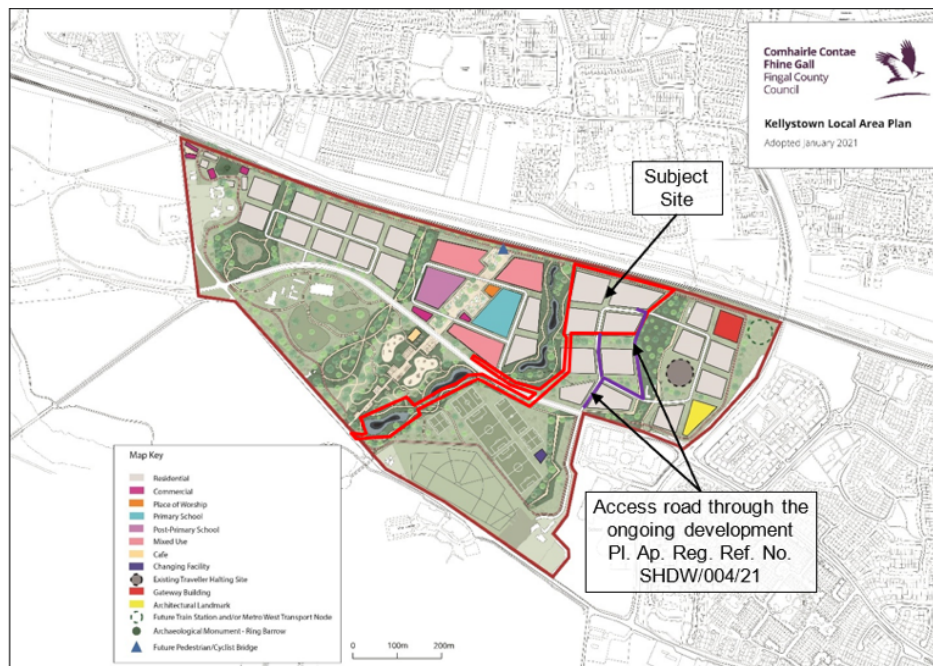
Site Access Roads through Kellystown Development Masterplan (Source: Kellystown Development Masterplan)
